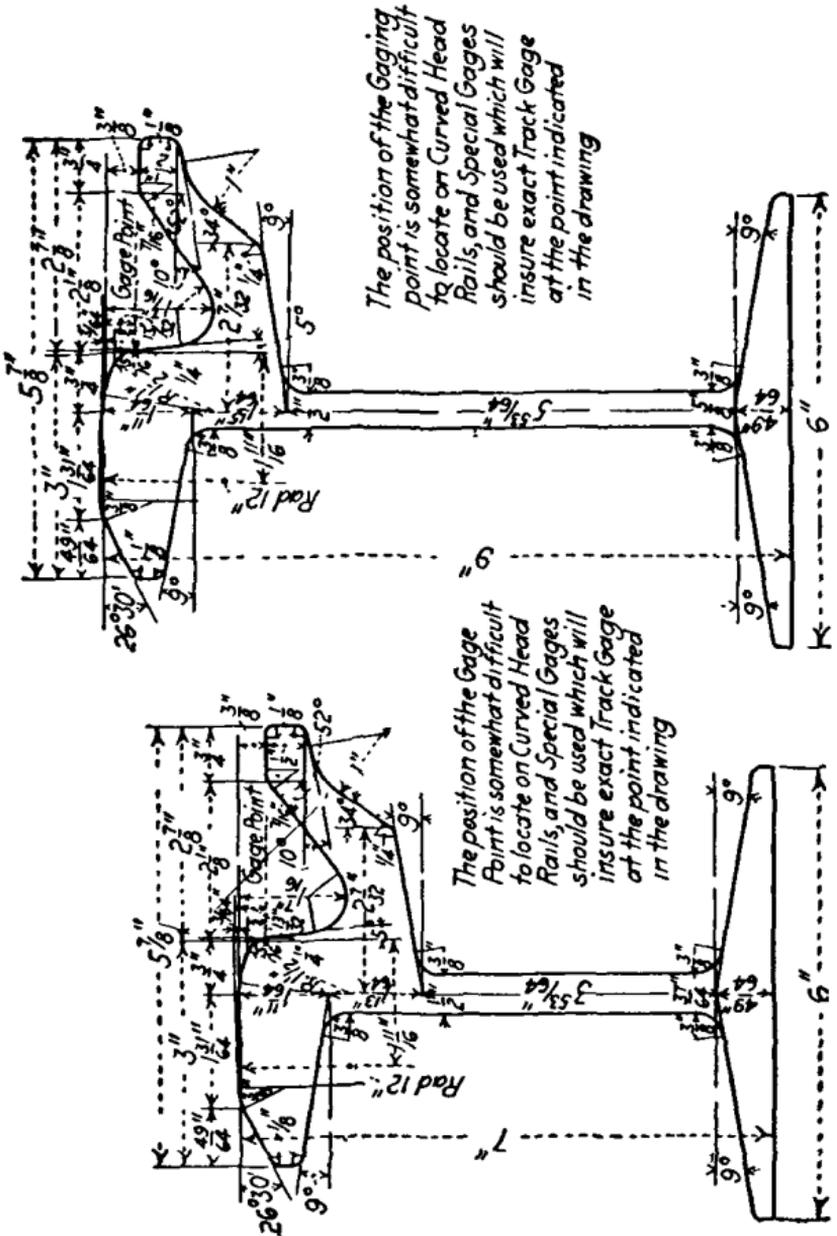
Am. El. Ry. Eng. Assn. 80-lb., 7-in. T-rail.
